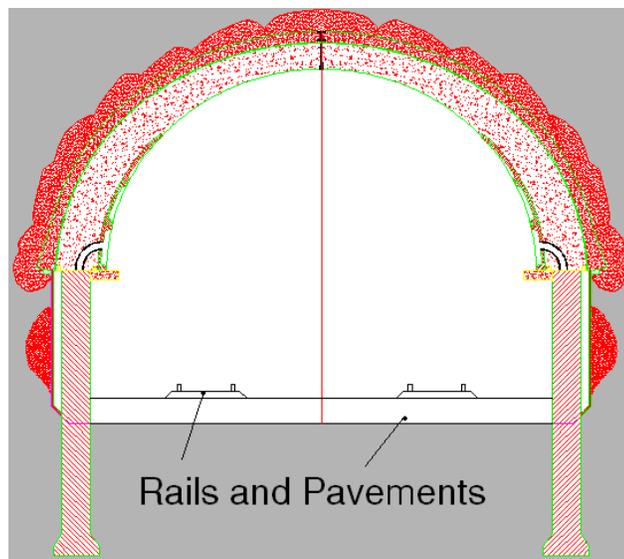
Step 13, Construction of Pavement and Installation of Rails
